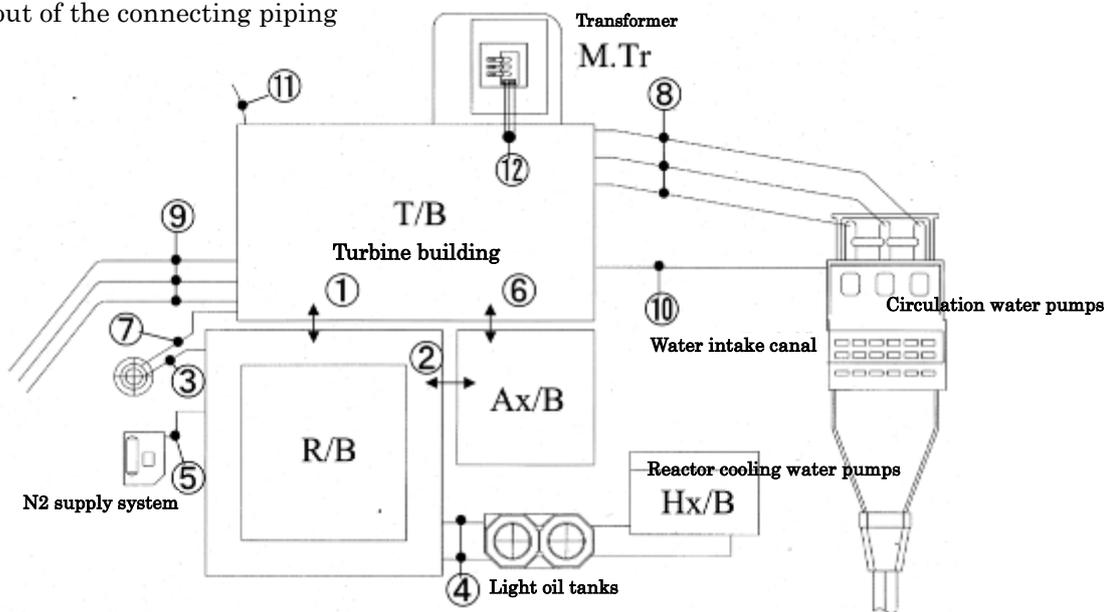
Example of layout of connecting piping in an earthquake-proof BWR plant
